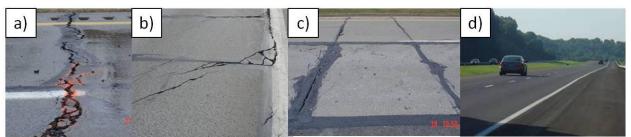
Panel LW-52 photographs showing (a) transverse cracking, (b) corner breaks, (c) highway deformation between saw cuts in the slabs, and (d) rehabilitated highway surface (Photographs from PA DEP files).
